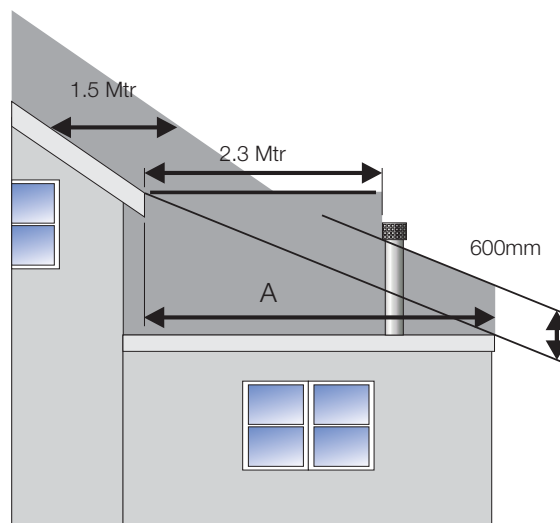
Termination through an extension roof adjacent to a taller sloped roof building (Gas Appliances).
